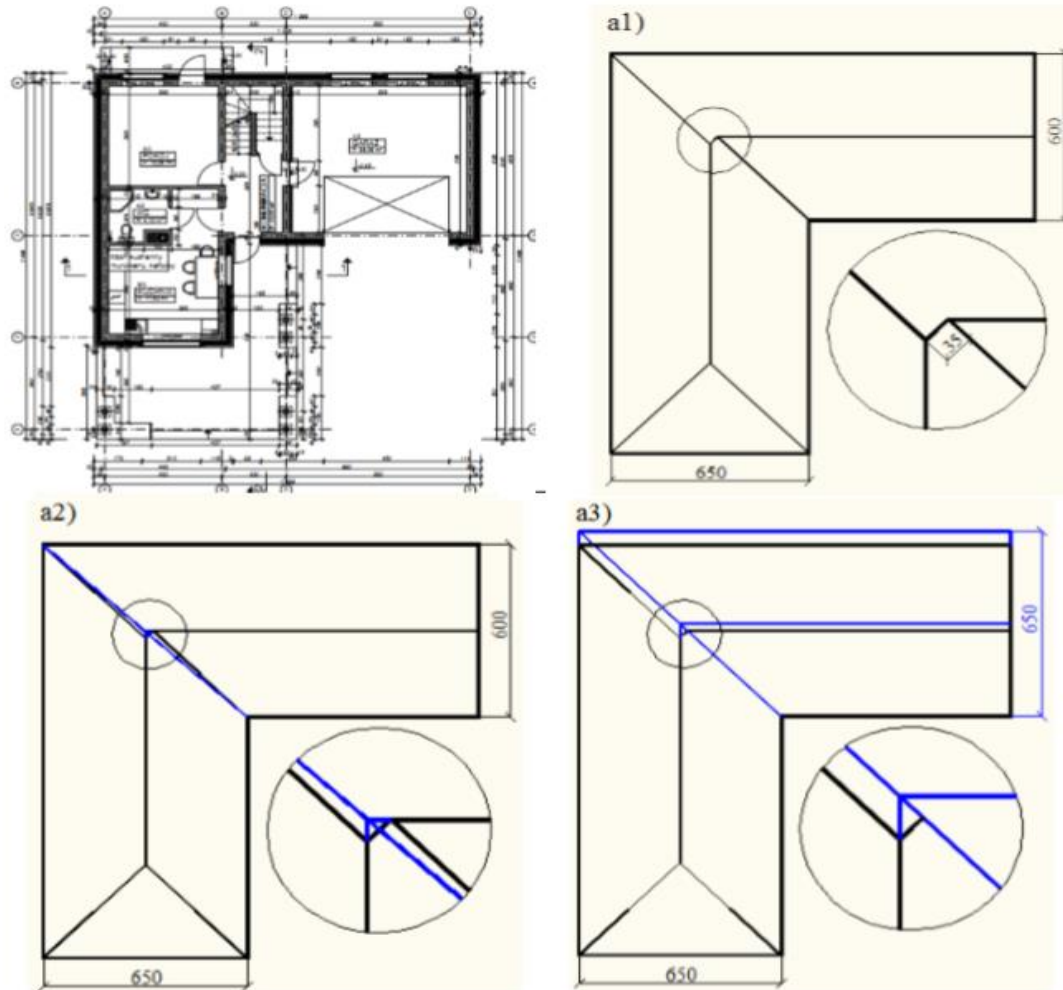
Correction of the outline of the designed building: a1) roof skeleton with given building outline - a short (35 cm) section of the roof ridge hindering the design of the board or ridge purlin; a2) roof solution for the designed outline; a3) correction of building outline - 50 cm shift of the building plan line and the locally symmetrical building plan obtained in this way
